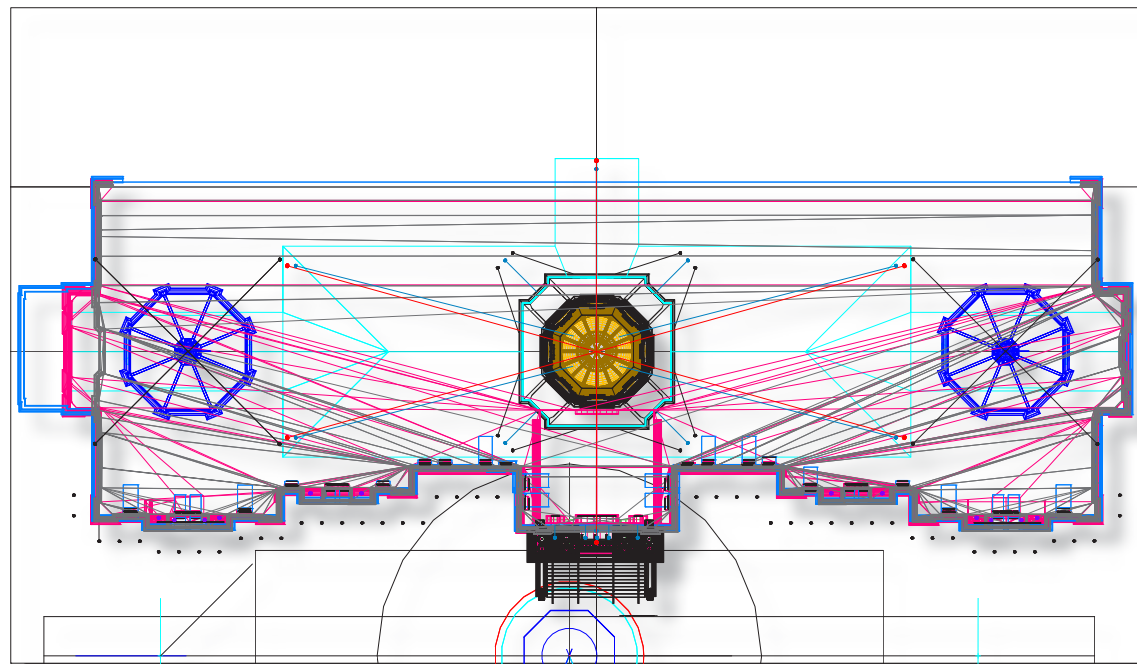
Lighting Calculation: Exterior Facade and Dome
